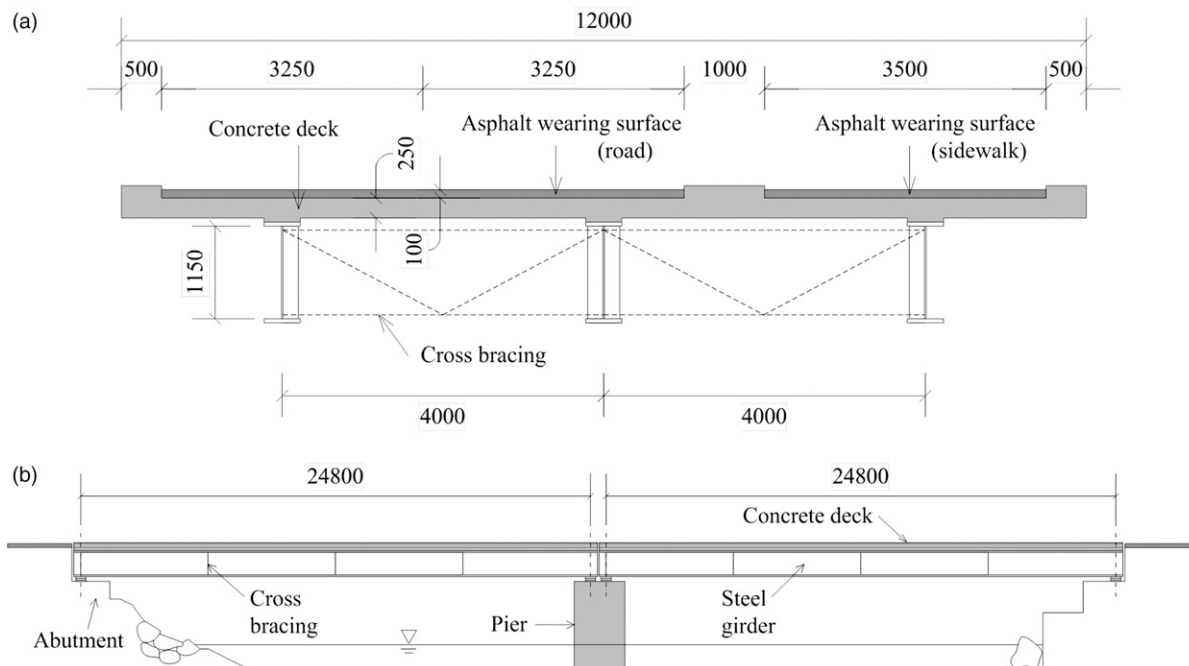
Case study bridge (all dimensions in mm): (a) typical cross section; (b) elevation
